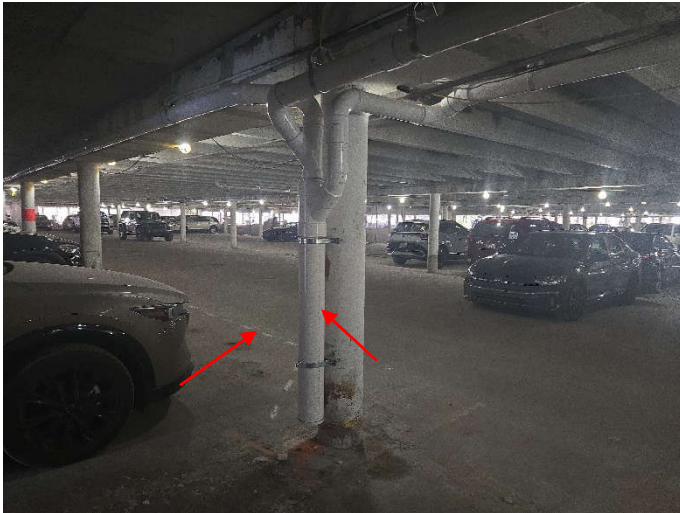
Plaza del Prado, Garage Deck Storm Drainage, Downspout ND1. Proposed underground layout. The missing clean-out must be installed.
